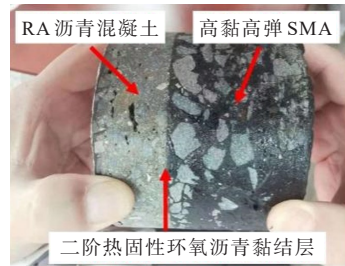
Pavement layer structure of Wujiagang Yangtze River bridge
